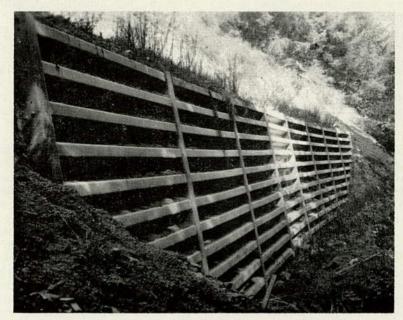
Restraining structure; metal crib wall near Santa Cruz, Calif. (Photograph courtesy of California Division of Highways)
